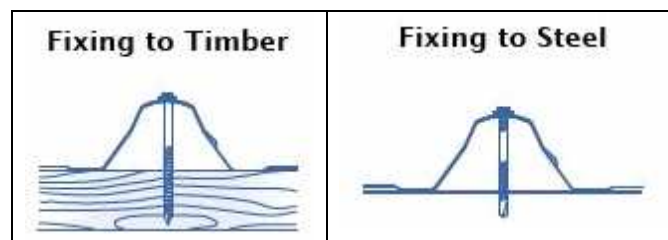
Roof fastener cases being considered: fixed to timber or fixed to steel.
